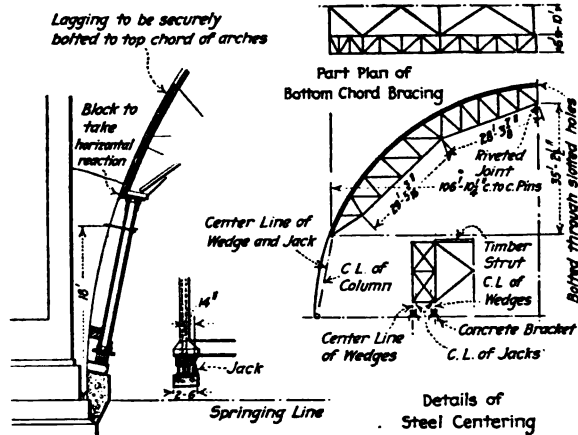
Details of steel centering for South Eighth Street viaduct, Allentown, Pa.
